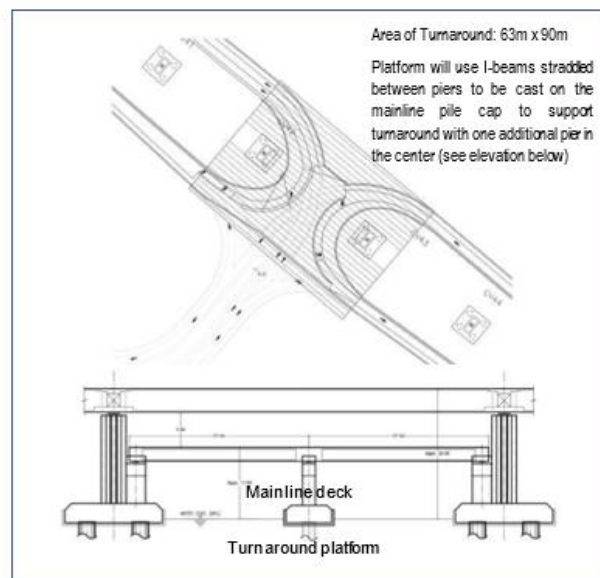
Plan View and Elevation of Turnaround Platform at Corregidor Island
